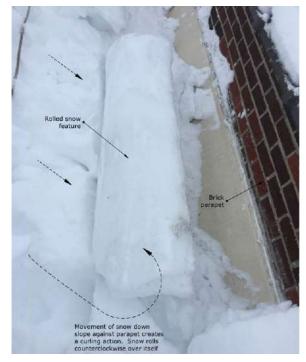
Paradigm photograph showing "curling action" of snow at parapet wall (Paradigm 2018)
